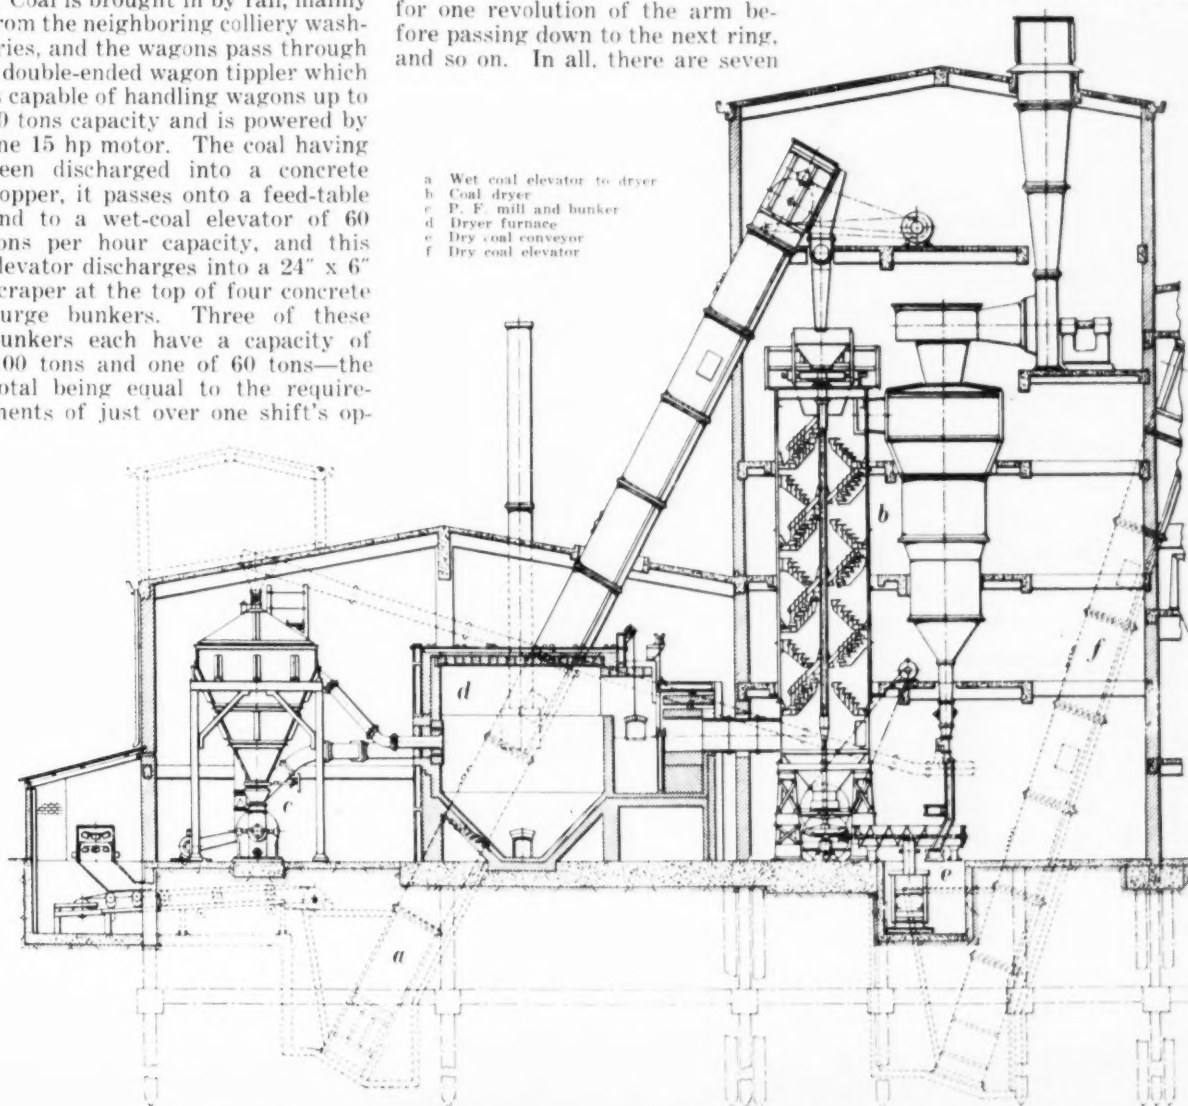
Cross-section through Coal Dryers and Briquetting Plant—left section.
